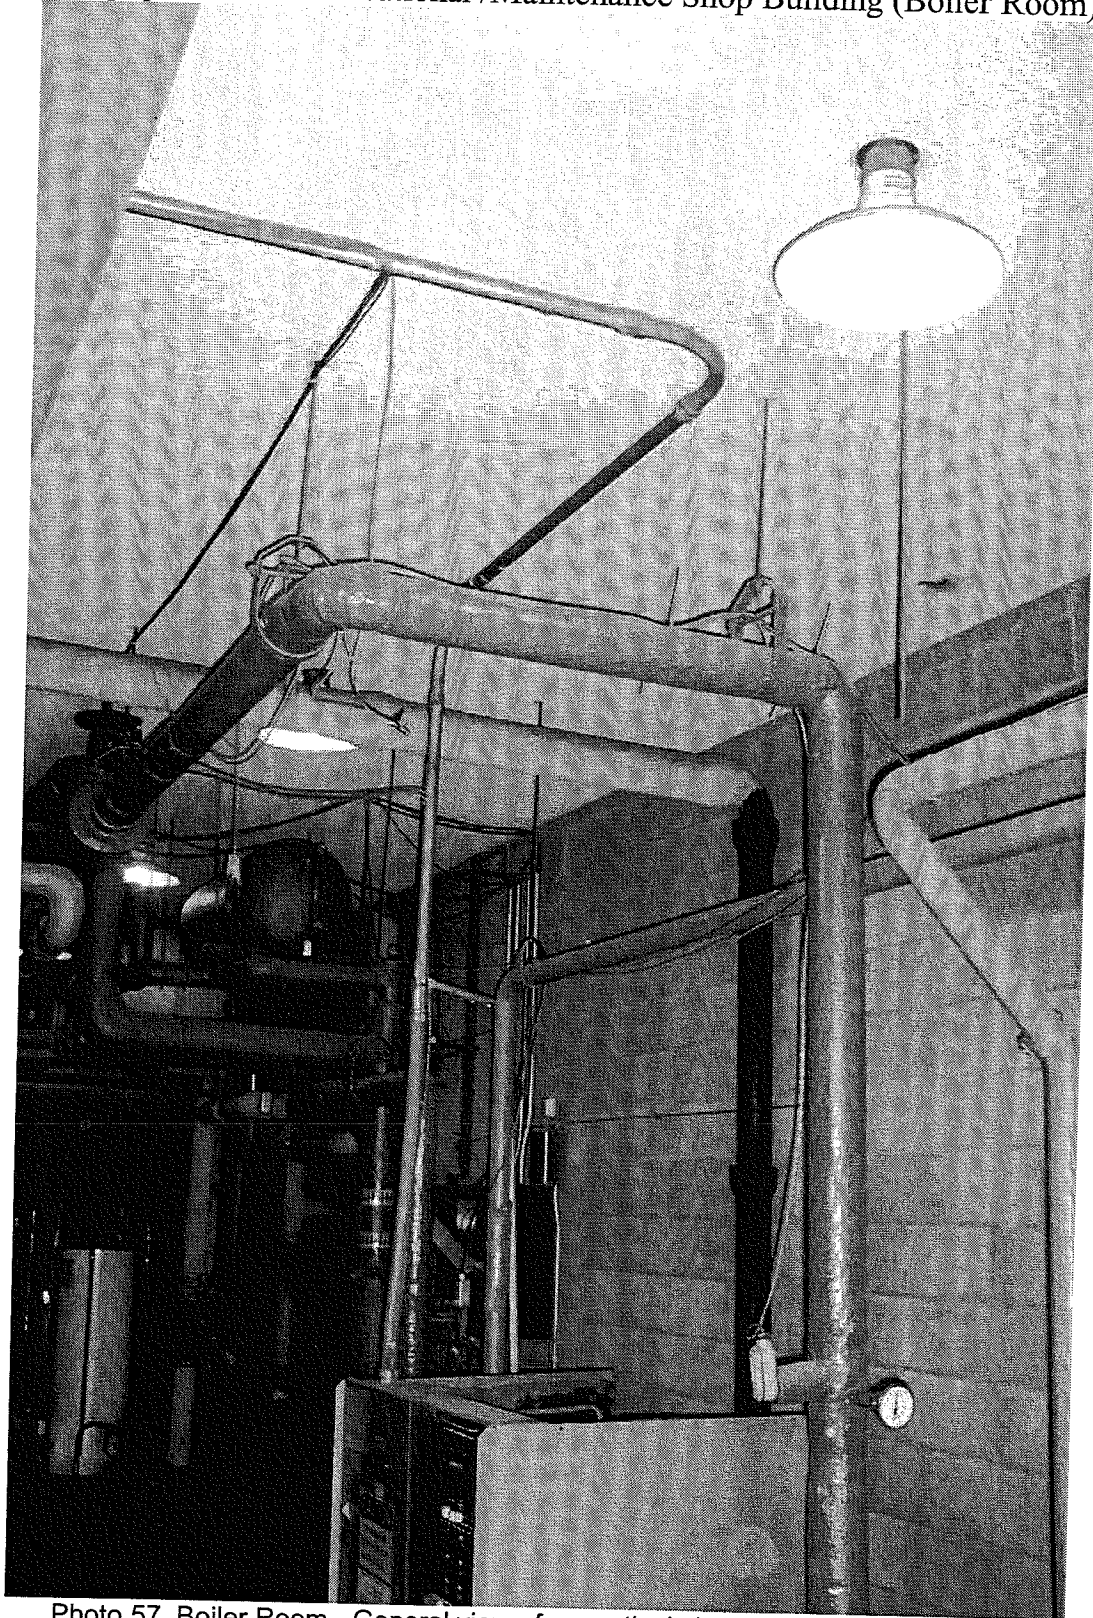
Boiler Room - General view of acoustical plaster ceiling in boiler room
